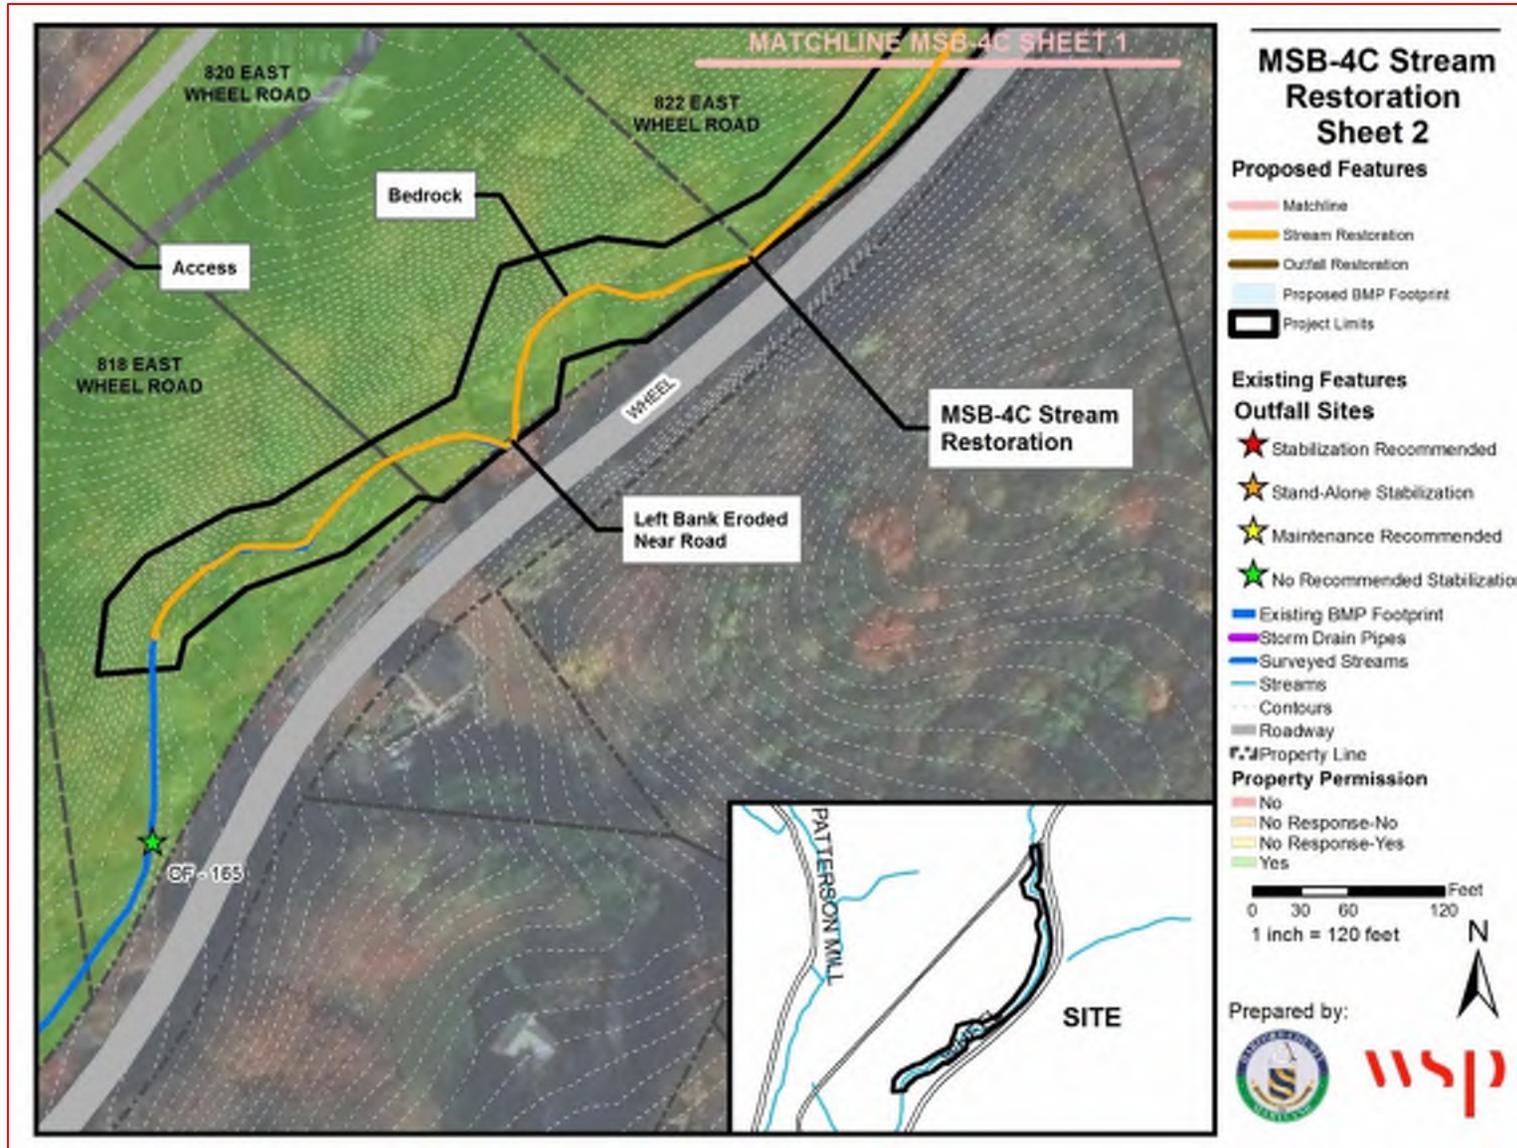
Site Location and Proposed Project Plan for MSB-4C Stream Restoration (Sheet 2 of 2)
